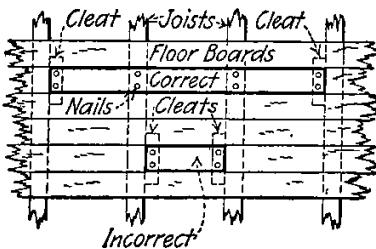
Methods of locating cleats to support floor boards that have been removed.
